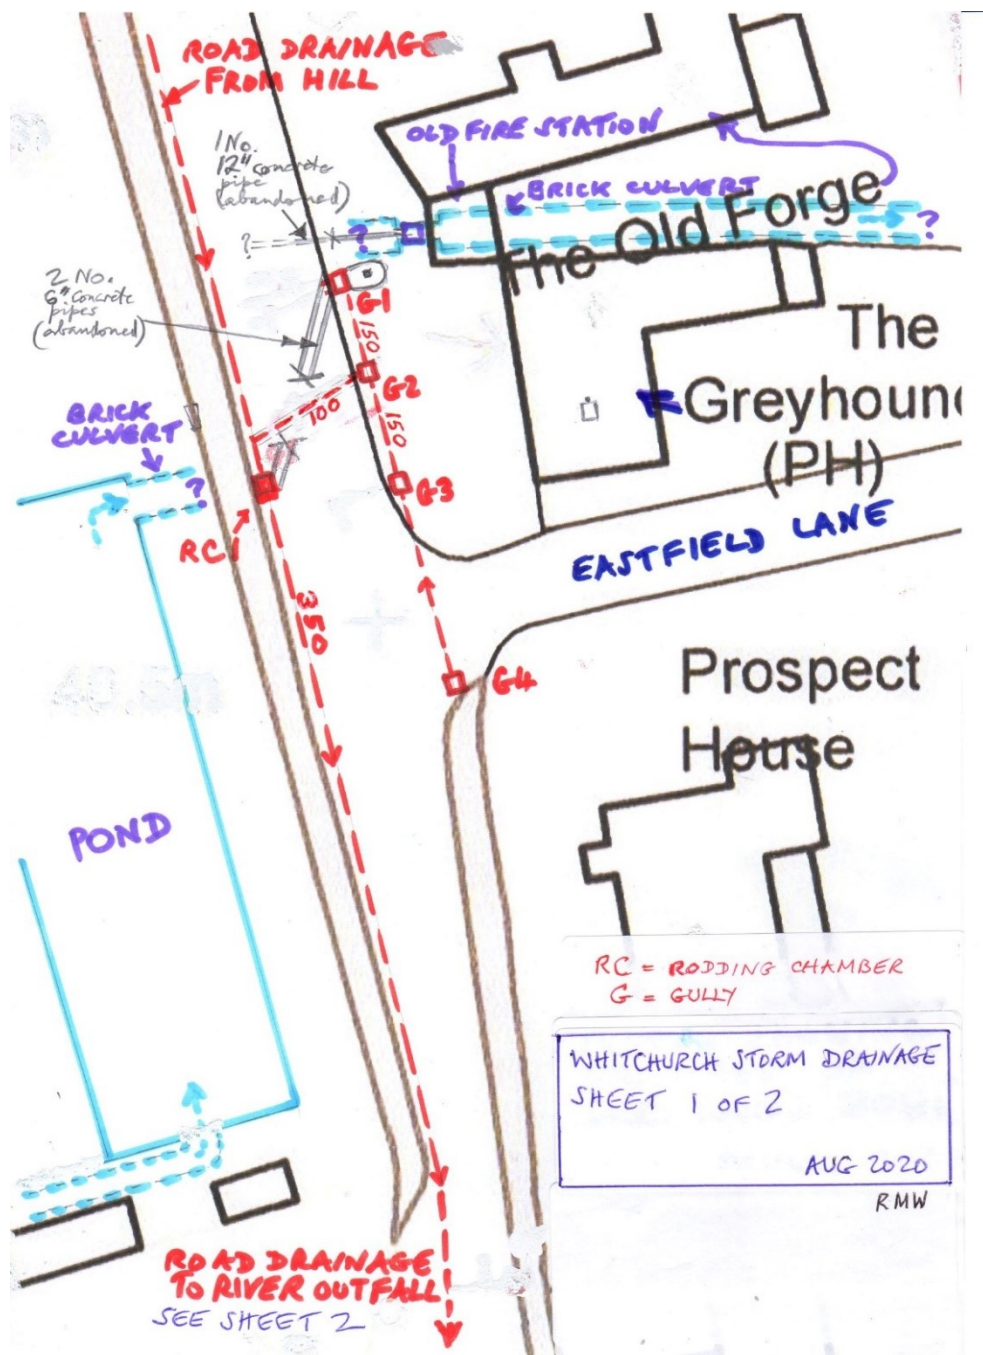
Sketch of storm drainage network, Sheet 1 of 2
